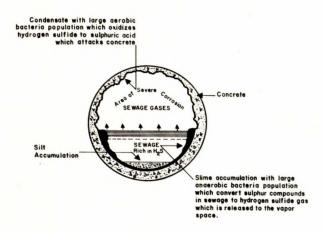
Cross-section of concrete sewer pipe under typical corrosive conditions (43)
